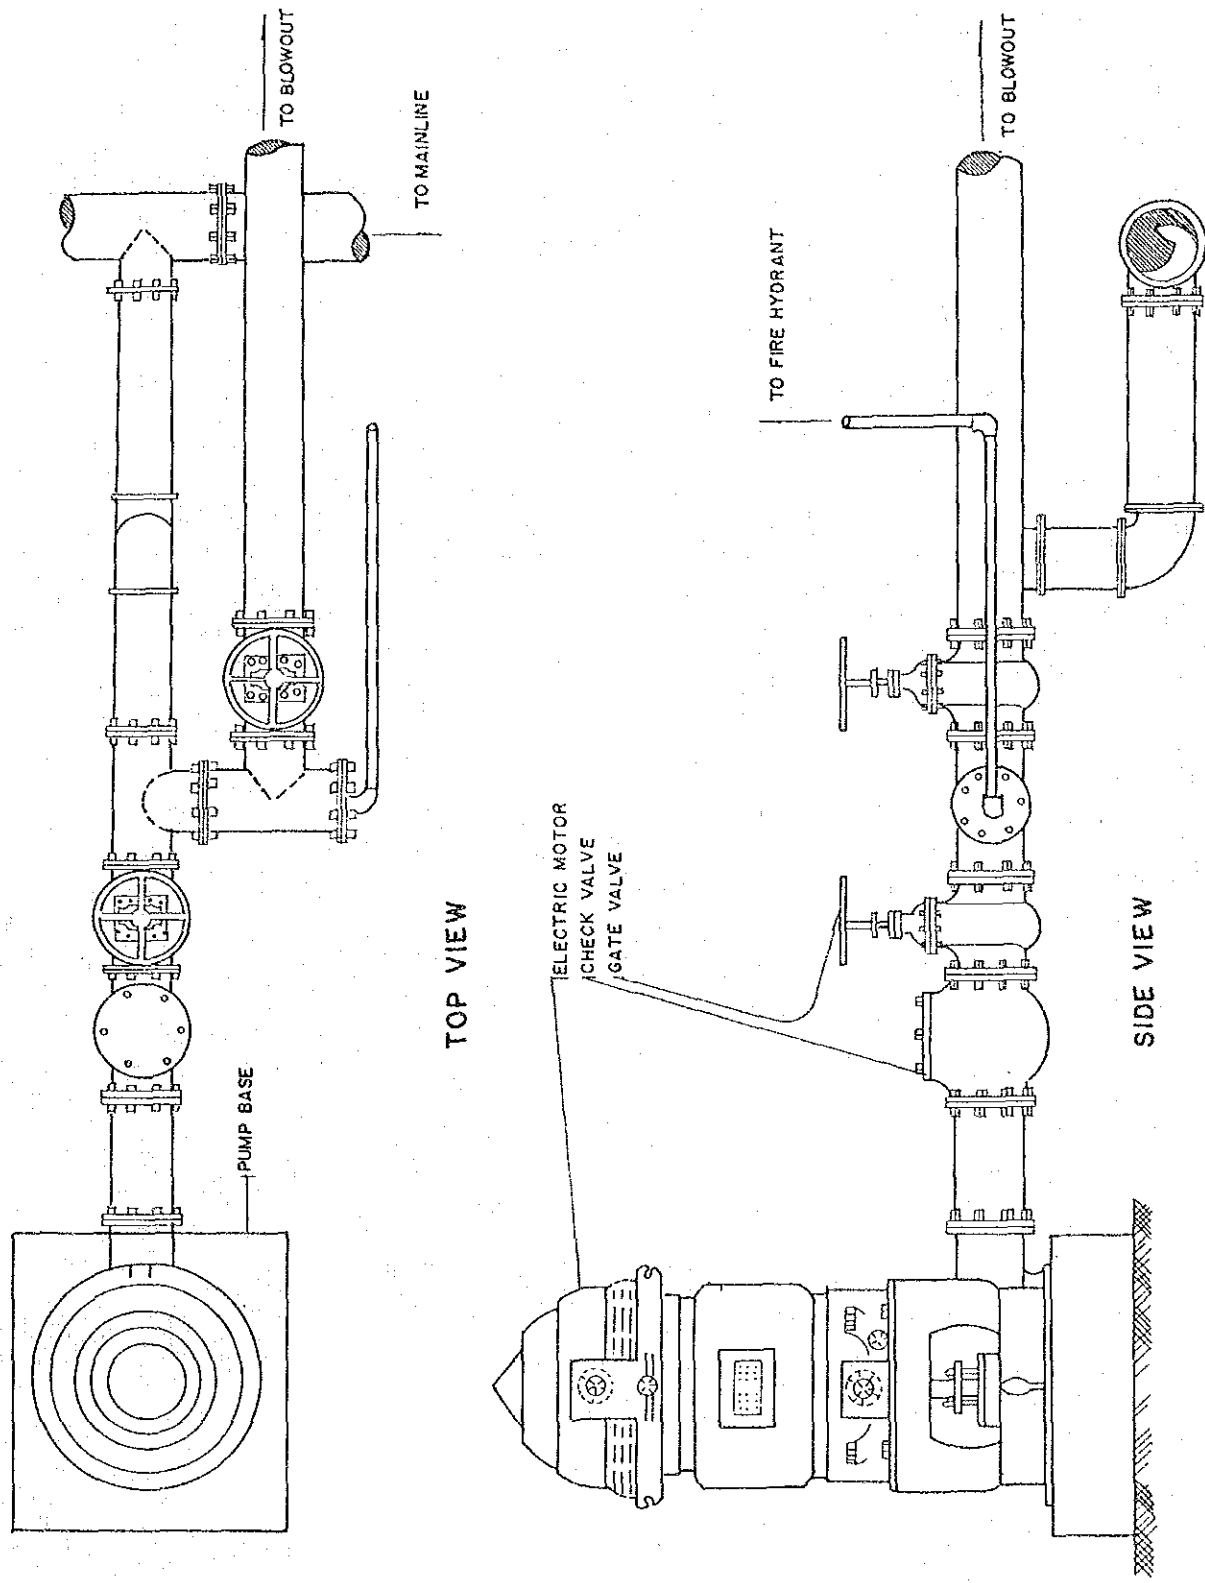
TYPICAL PUMPHOUSE CONNECTION
